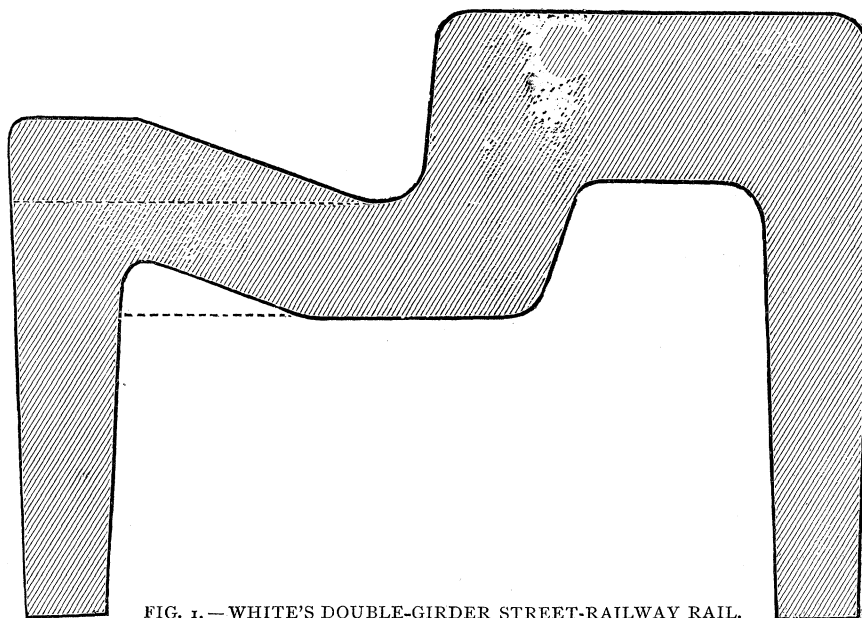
WHITE'S DOUBLE-GIRDER STREET-RAILWAY RAIL.
